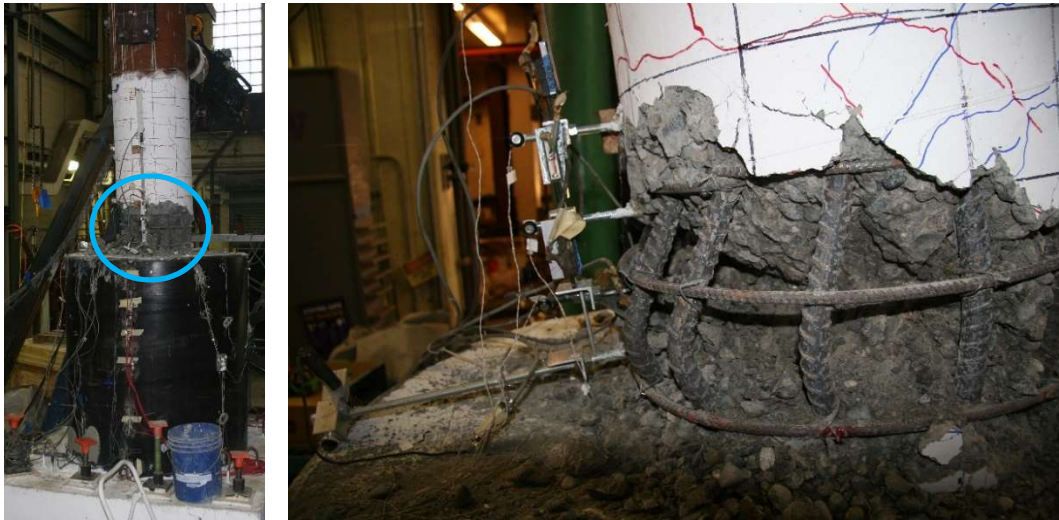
Specimen 48-21 North Face Severely Buckled Longitudinal Reinforcement Bars at 8.6% Drift
